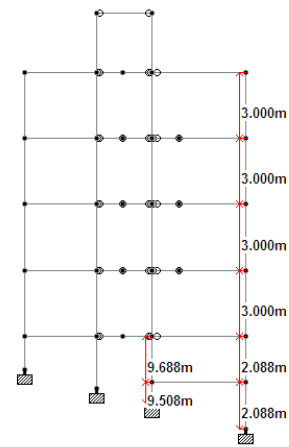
Elevation of residential building on 15 deg. Slope
